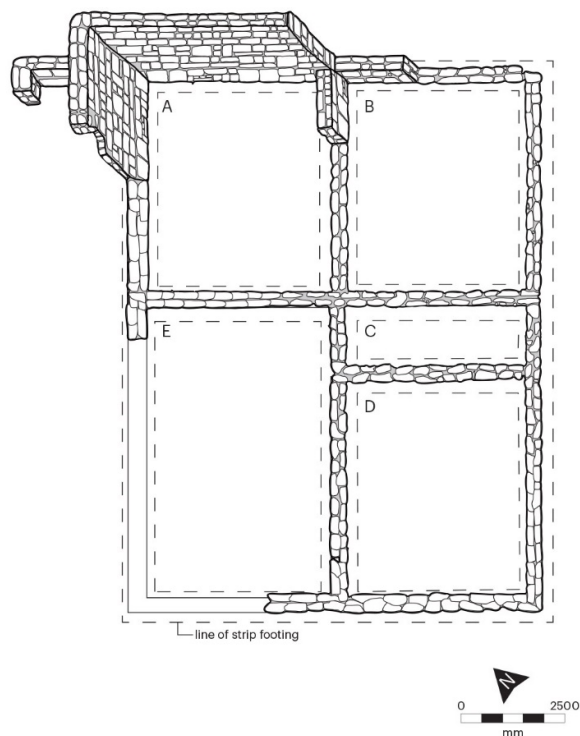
Floor plan and axonometric view of the stone building (after Heyworth 1987: Appendix A). Areas A and E lie on the northwest side of the building parallel to Watson's Bay. Measurements in mm.
